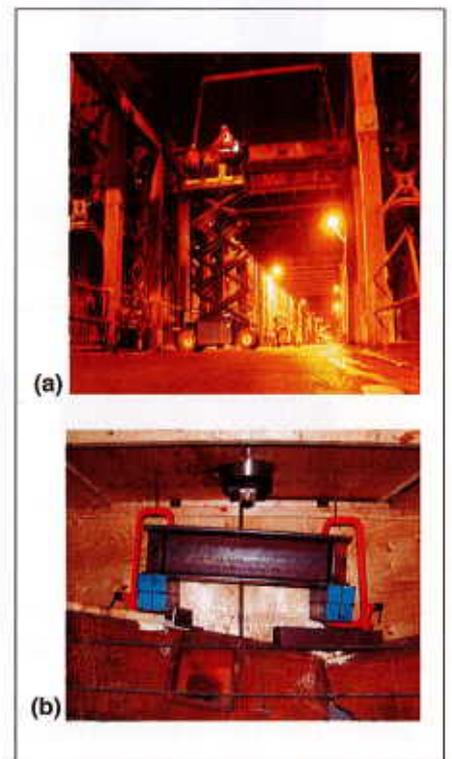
Testing of the cast iron cross girders: (a) removal from the bridge; (b) full scale fatigue testing.
